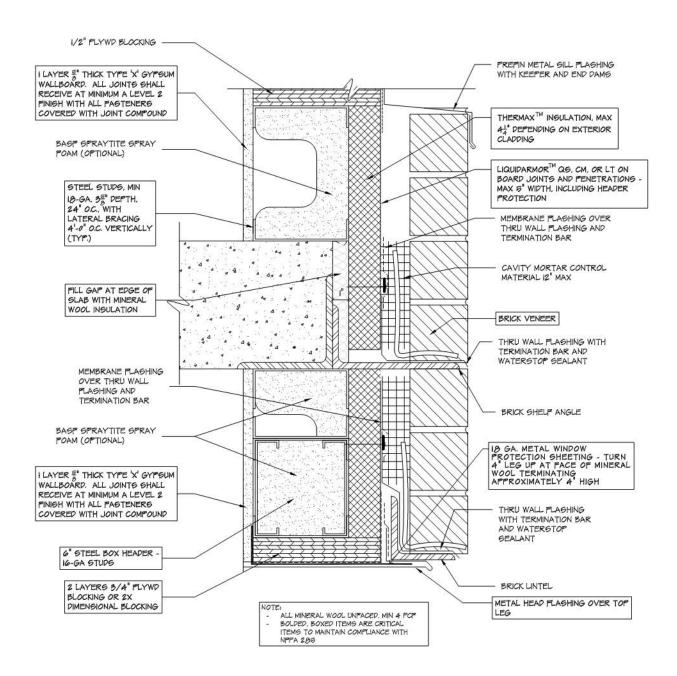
Required Opening Head Protection When BASF SPRAYTITE® 81206 Spray Foam Is Used in the Cavity (Infill Wall Construction with Brick Façade)
